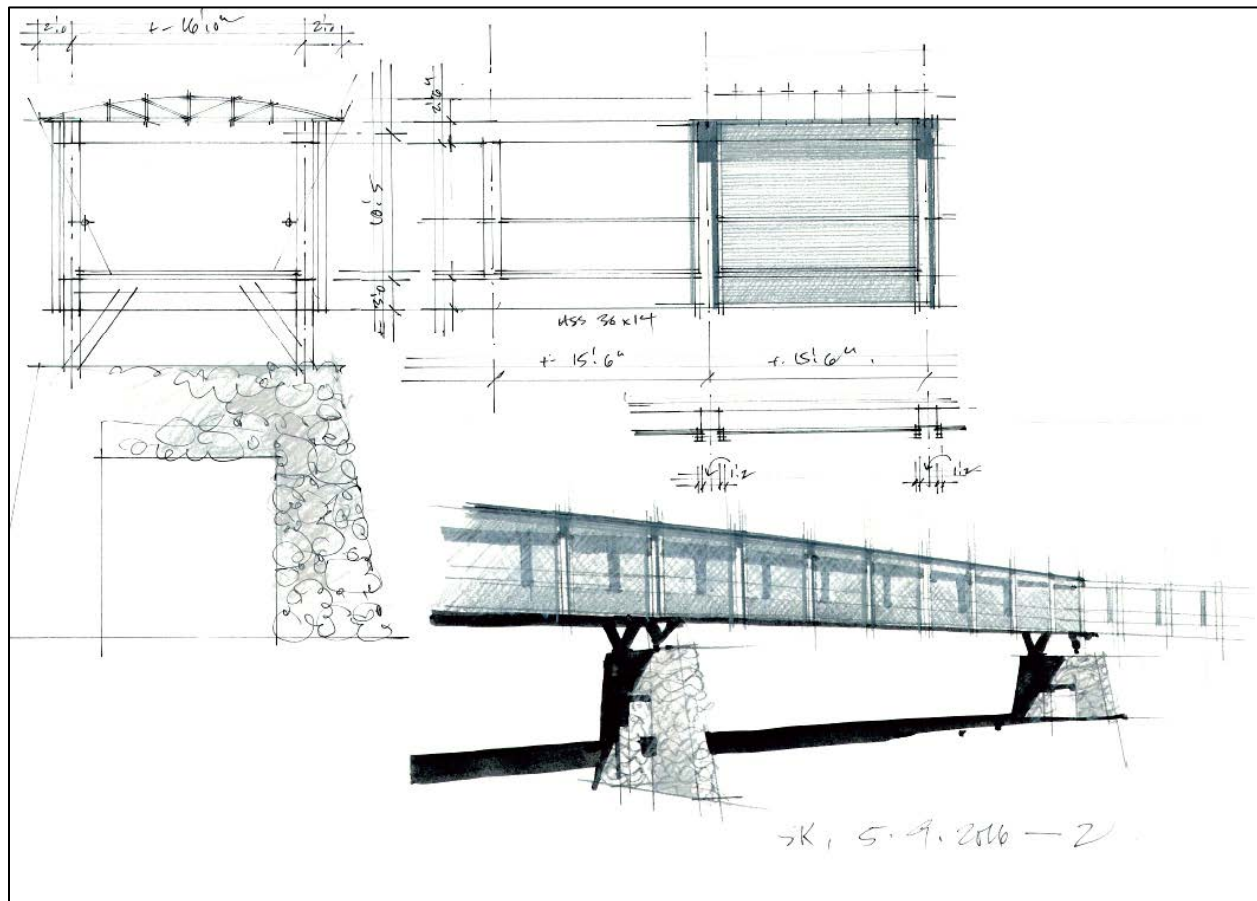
Refined truss system for the pedestrian bridges with stone piers, visually minimal diagonal chords, a curved roof and mesh walls.
